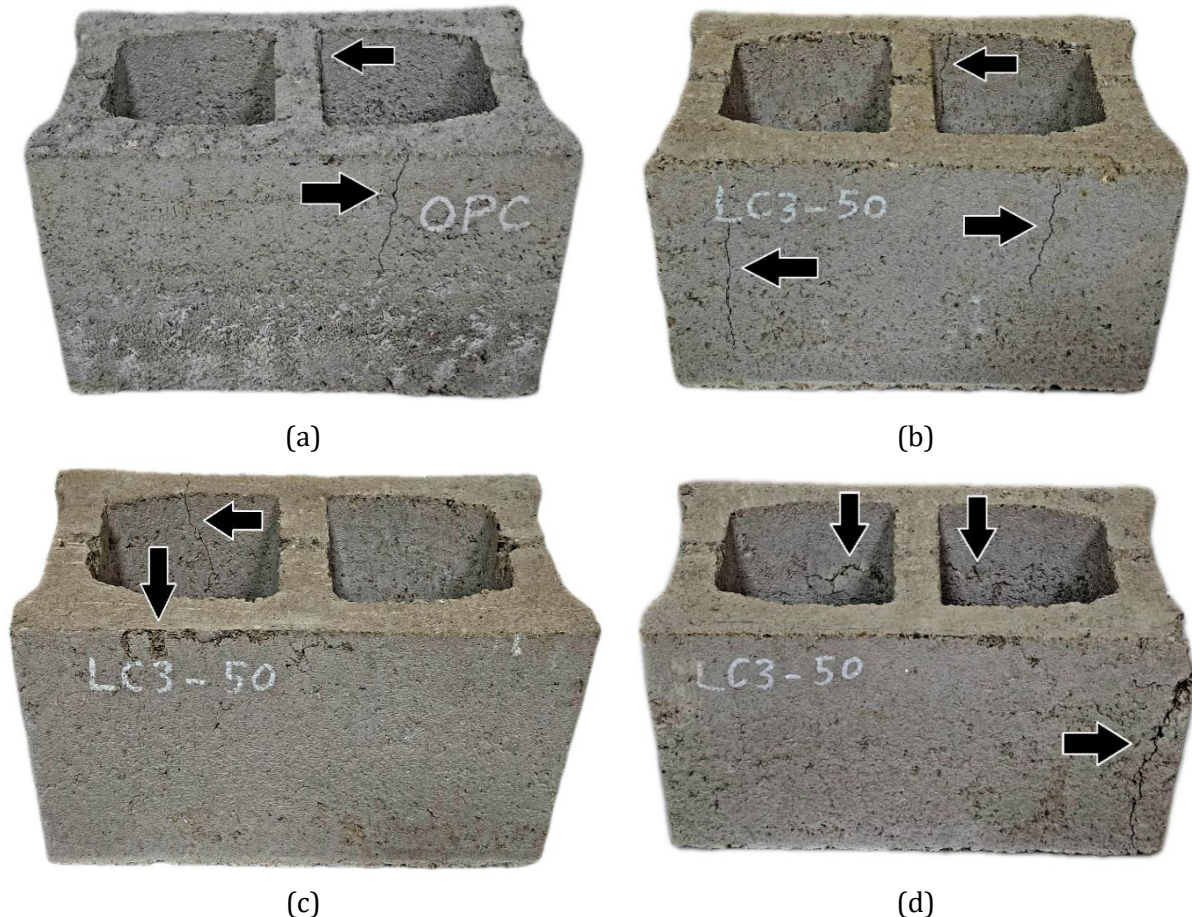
Failure modes (a) cracks in face shells of OPC block (b) cracks in face shells of LC³-50 block (c) cracks and spalling in face shells of LC³-50 block (d) spalling in face shells of LC³-50 block
